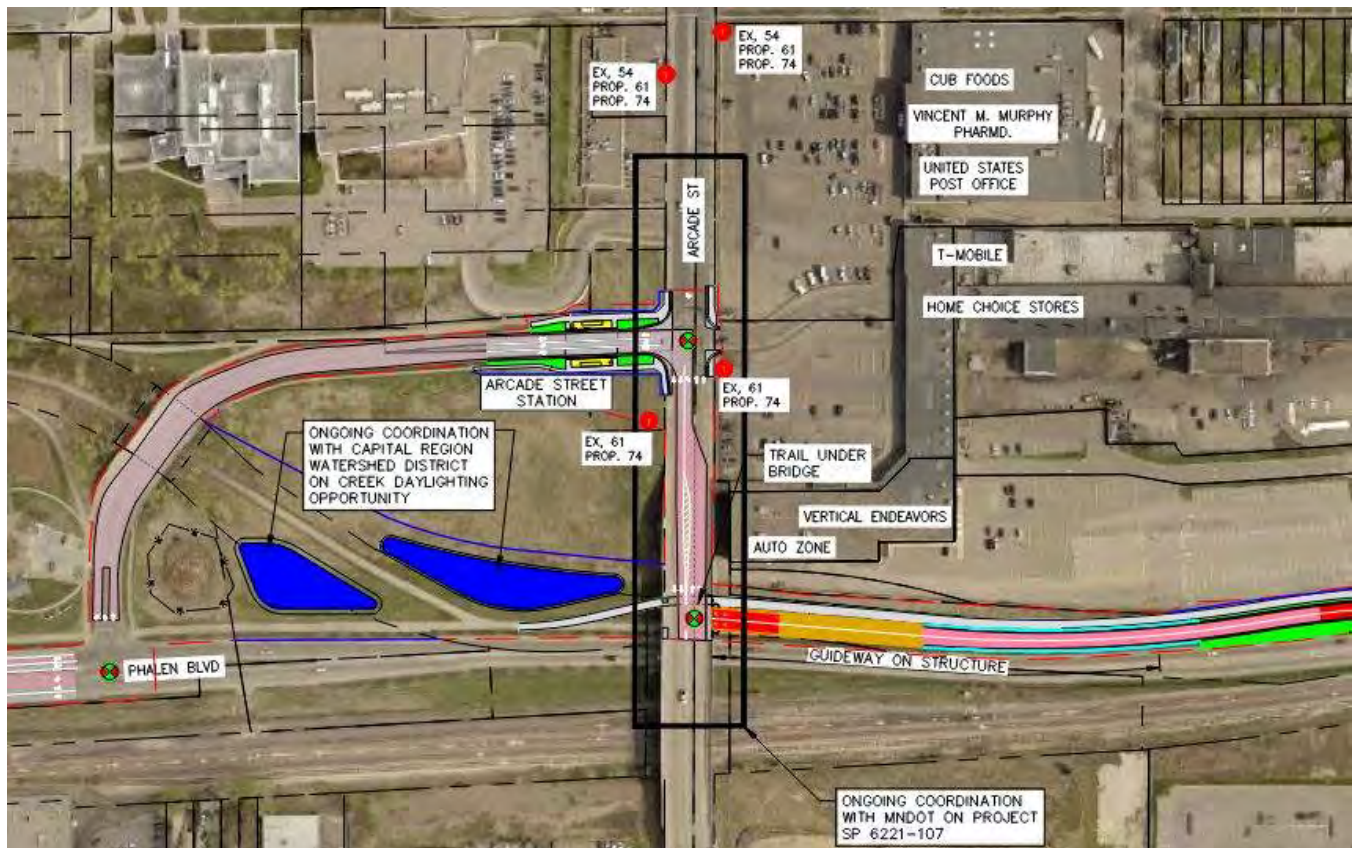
25% Design at Arcade Street Station Area (2021)
